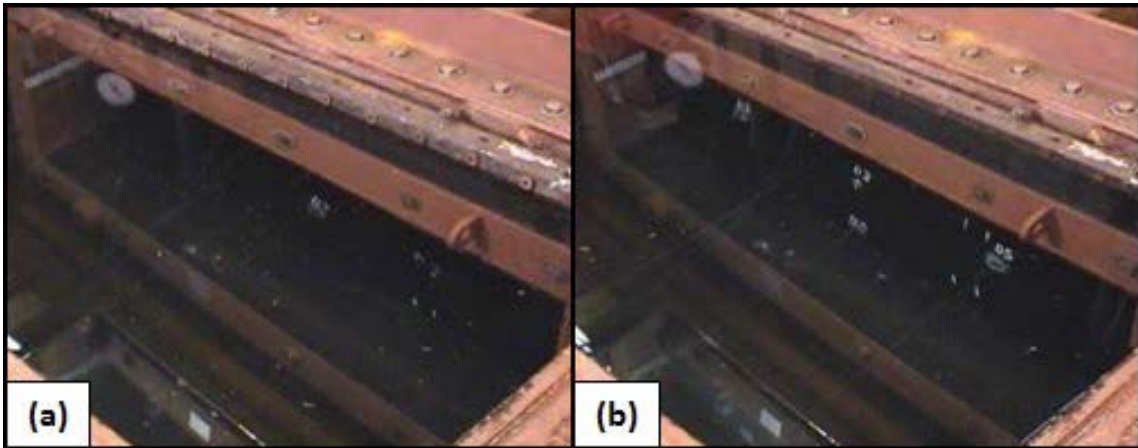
SW7. (a) Pretest photo of Wall SW7. (b) As the wall deformed all three centerline gauges became visible.
